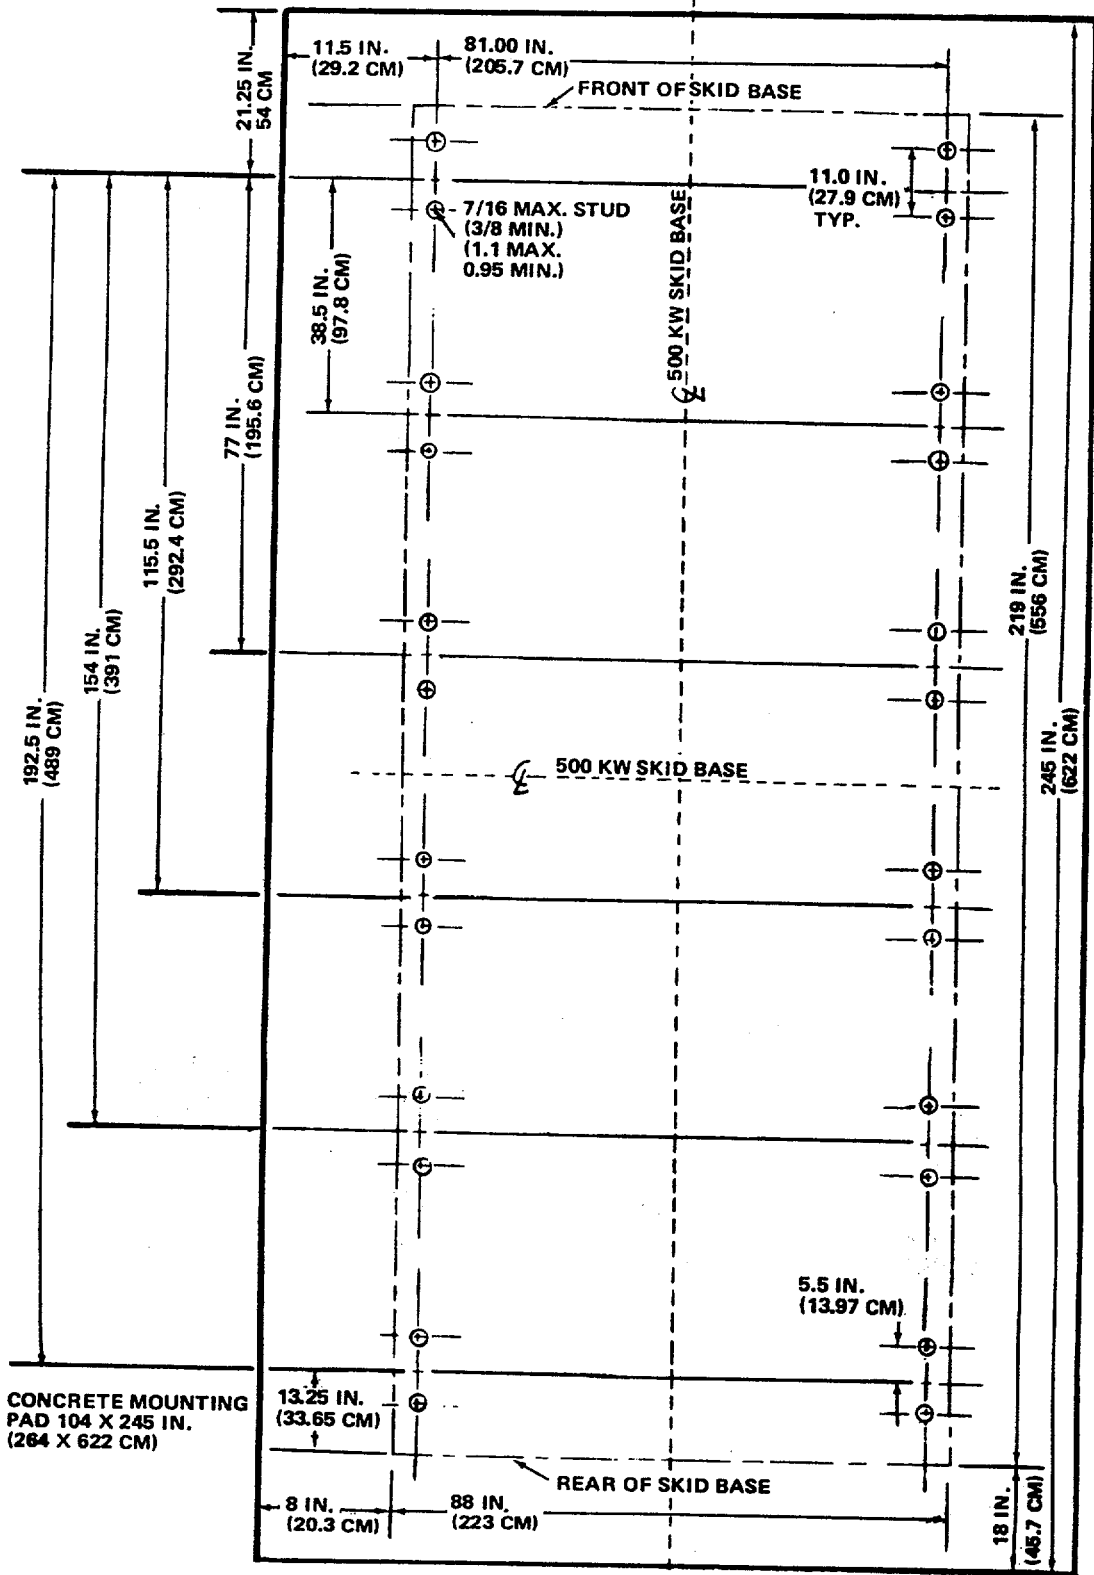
Mounting Bolt Layout in Concrete Pad
